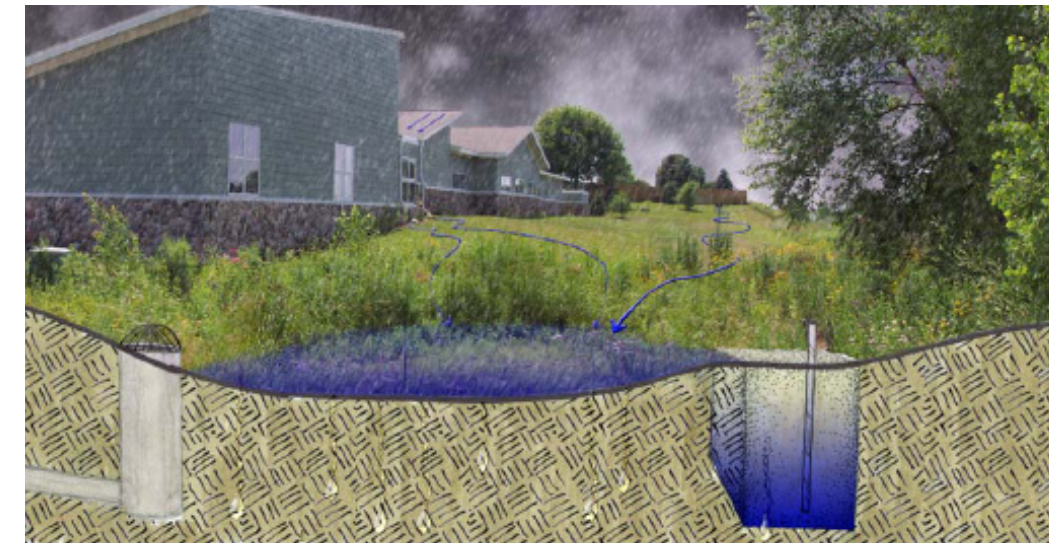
Cross section of the MSA infiltration trench (Source: stormwaterbook.safl.umn.edu, 2011)
